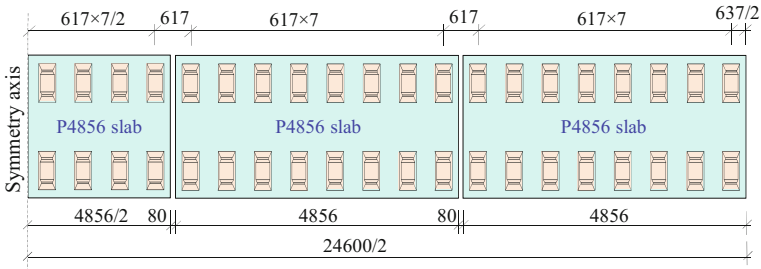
Layout of CRTSIII track slab units on 24 m simply-supported beam (unit: mm)
